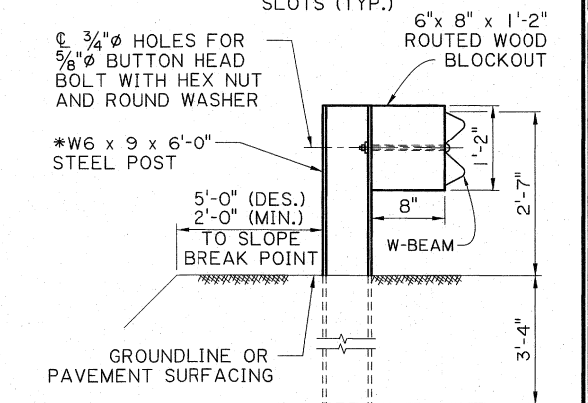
x 9 STEEL POSTS AND WOOD BLOCKS-STD. GUARD RAIL
